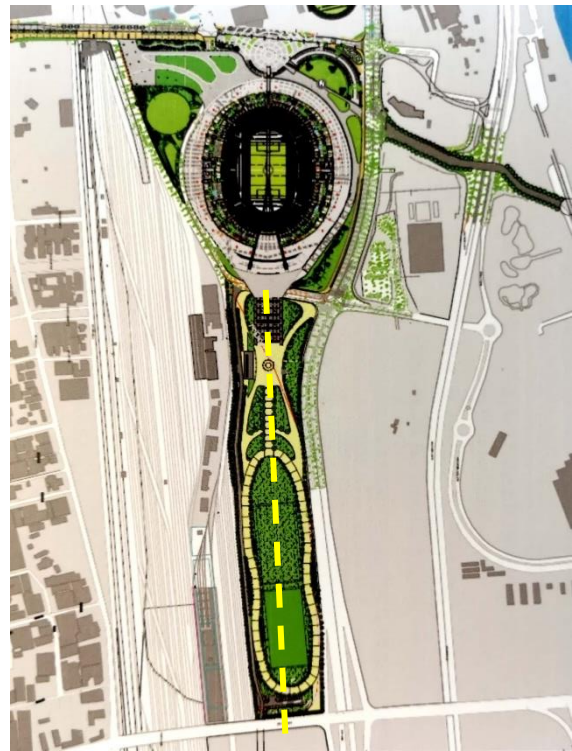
14: Contextual site plan and approach (Source: Adebayo, 2012: 23)
